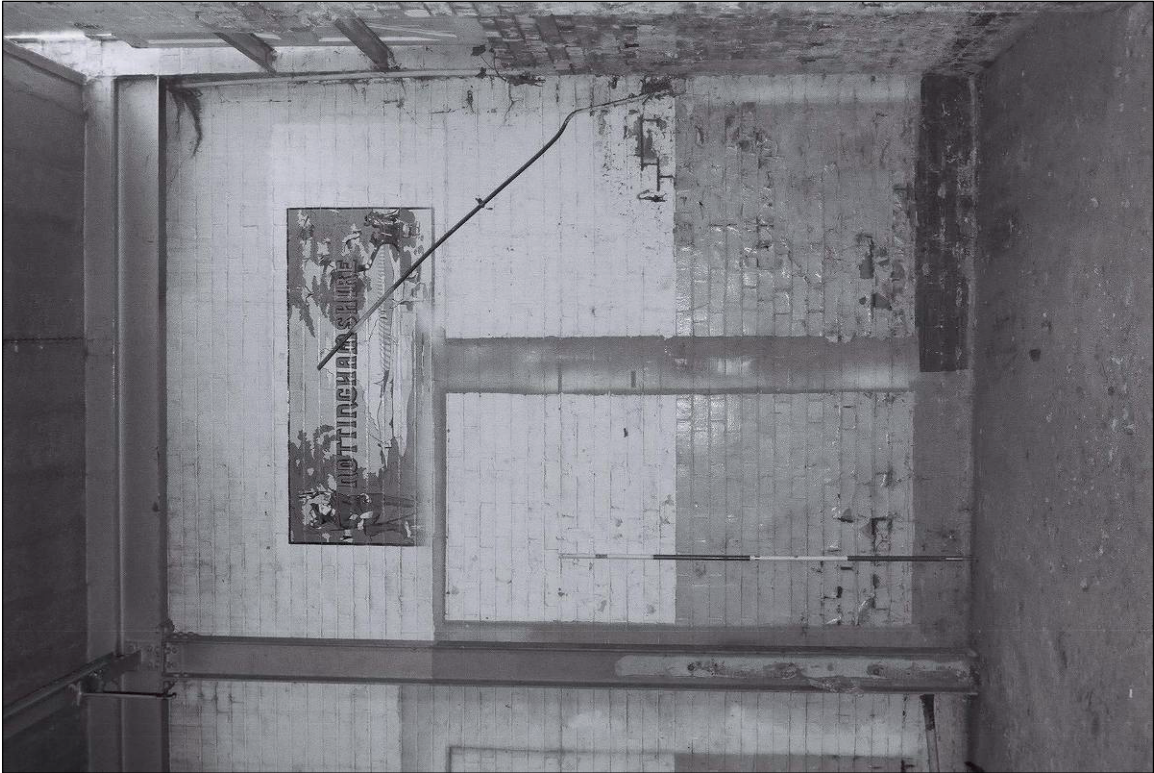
Detail of 'Nottinghamshire' mural on northeast wall of G5 (film 12.32)
